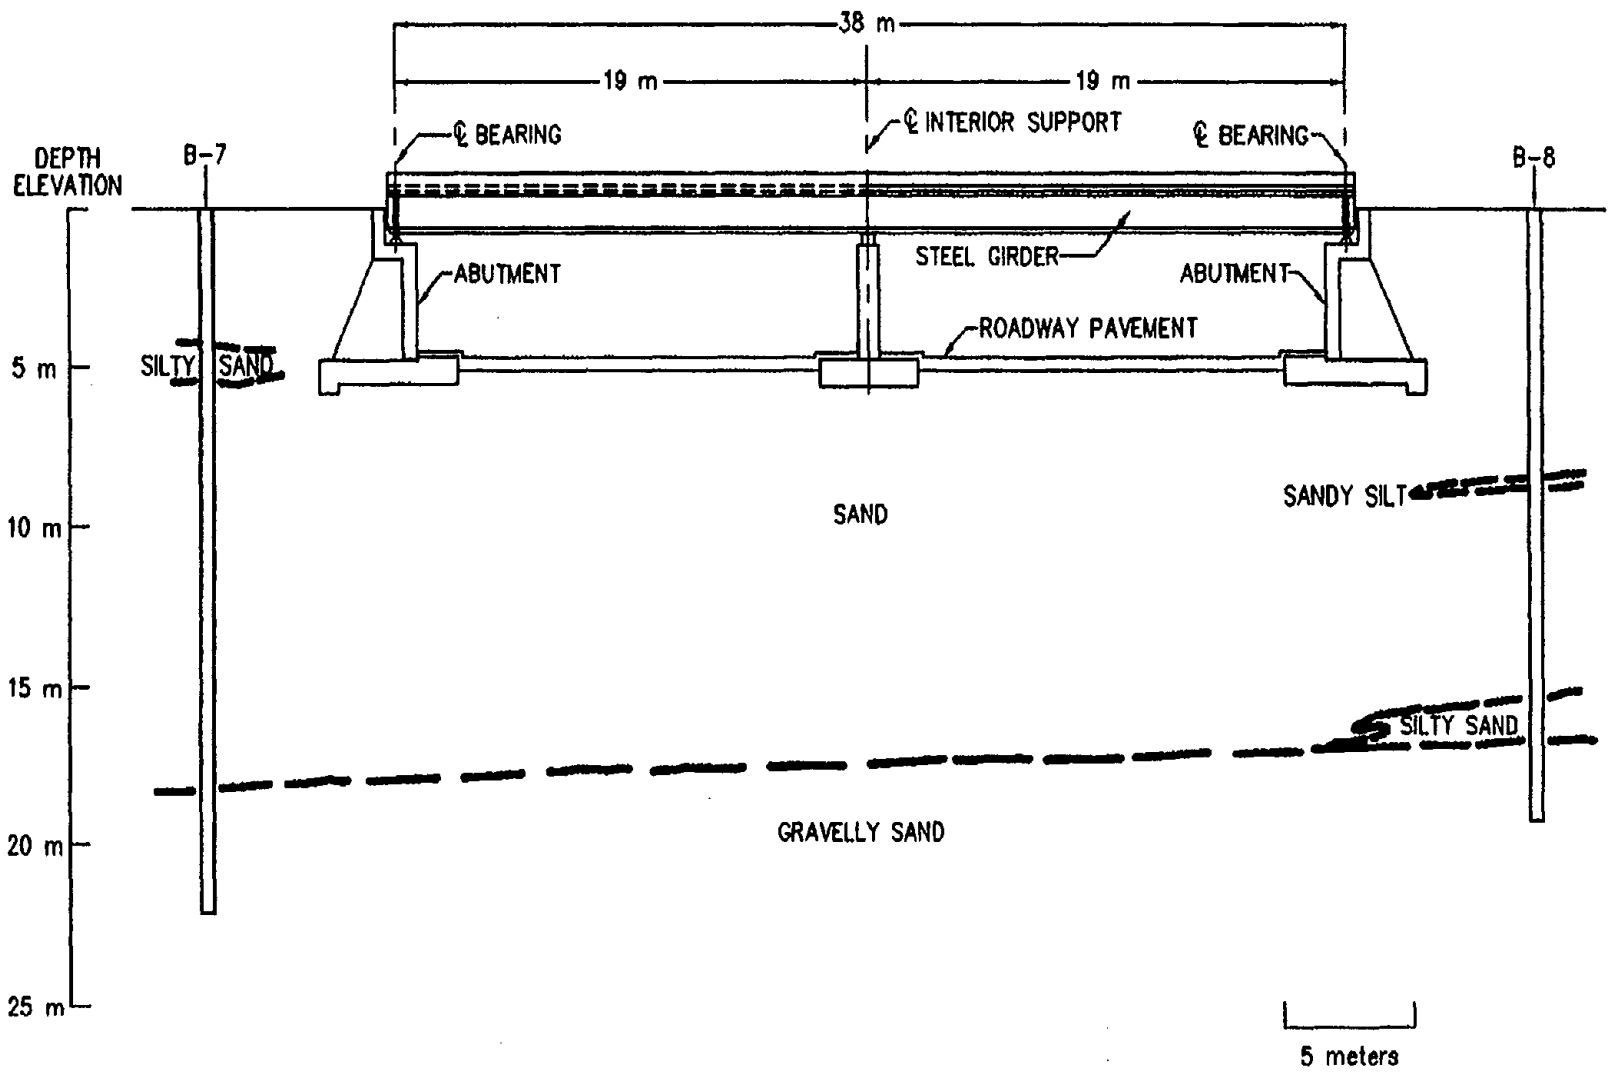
Cross Section of Proposed Bridge and Soil Stratigraphy.
